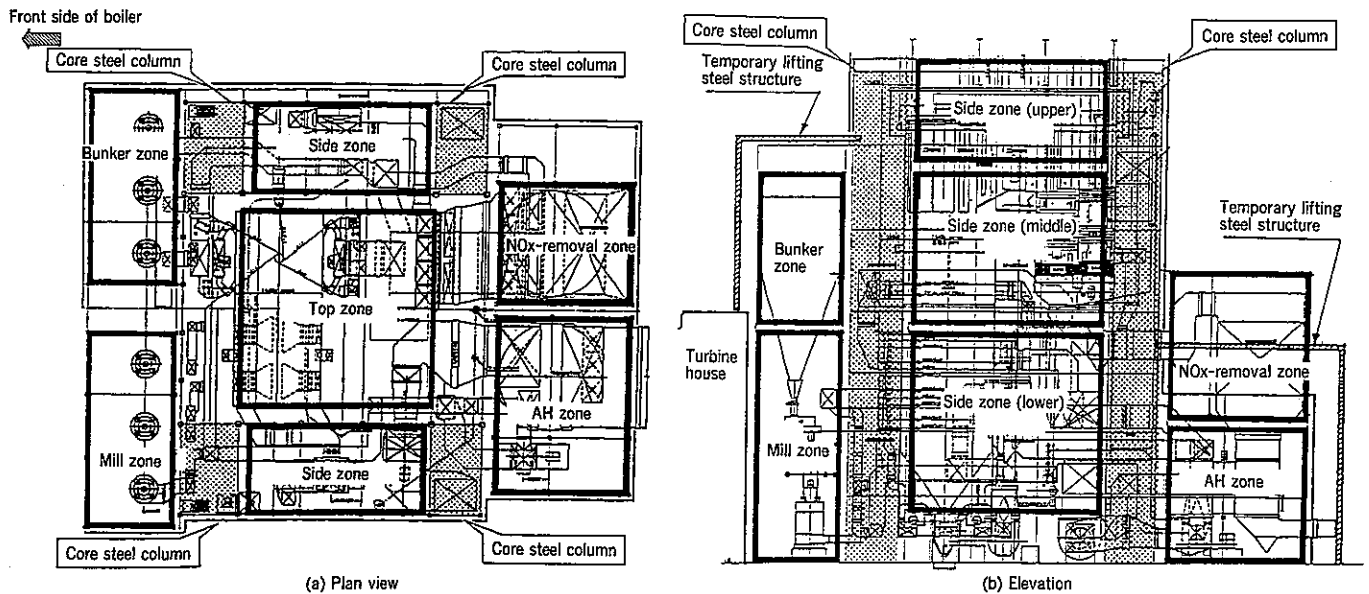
Sectional arrangement drawing of Haramachi No.1 zone module
